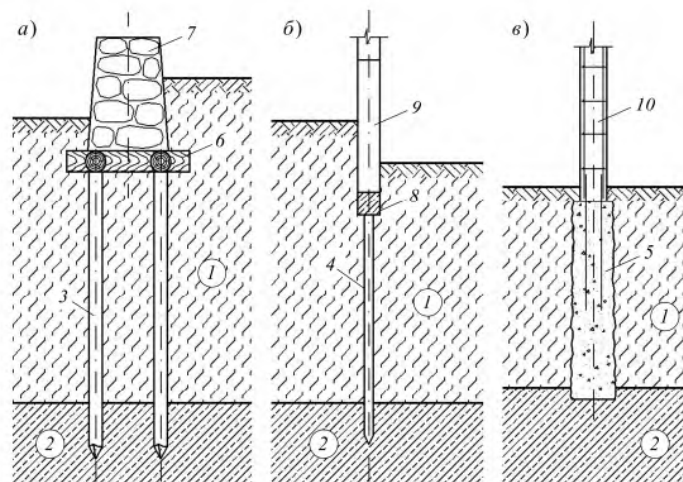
Cases of using pile foundations: a – foundation of a house built in the 18th–19th centuries; b – pile foundation of a load-bearing wall of a large-panel building; c – pile-column of a modern industrial building; 1 – soft soil; 2 – dense soil; 3 – wooden pile; 4 – reinforced concrete
